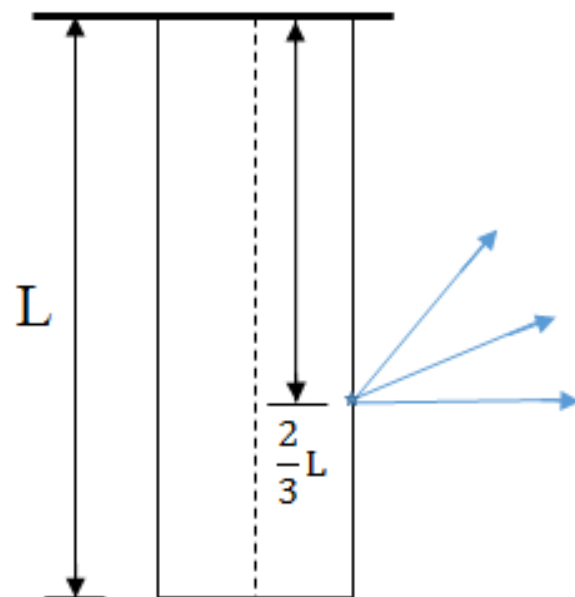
Padeye located at $2/3$ of the caisson wall
